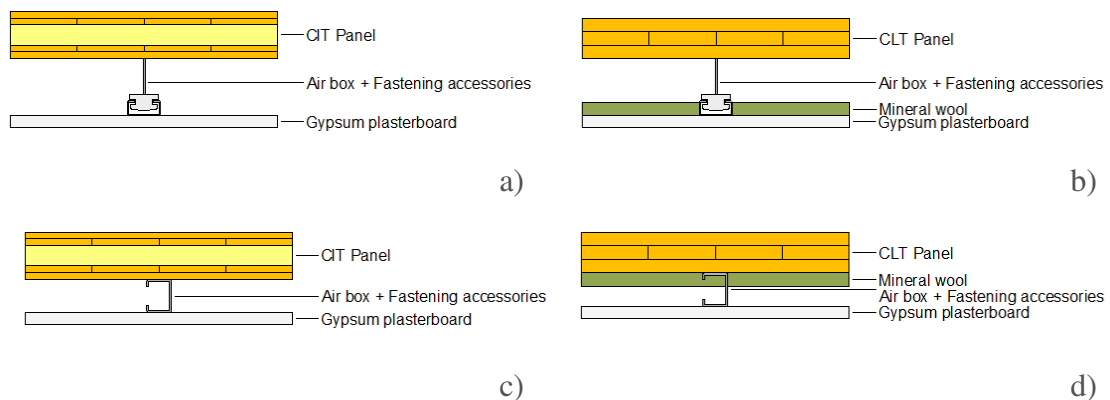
Building scheme for the different panel solutions: a) CIT floor; b) CLT floor; c) CIT wall; d) CLT wall.
